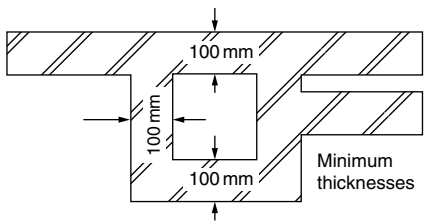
Masonry and flue block chimneys – wall thicknesses.
